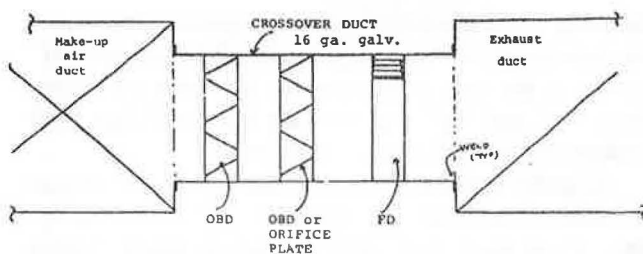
Make-up air to kitchen exhaust bypass connection detail.
